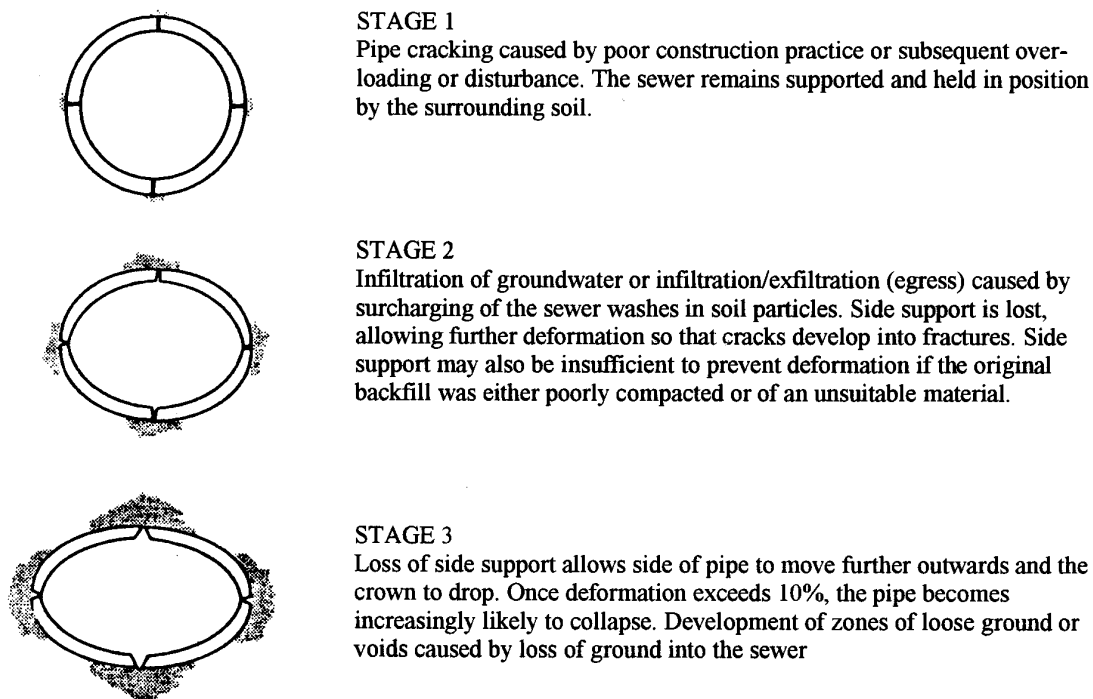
Typical progress in failure of a rigid sewer pipe
